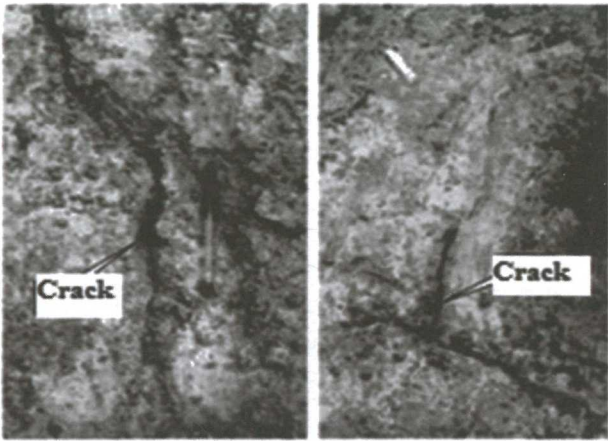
Photos showing excavation of cracks inside a sloping clay core for corroboration.
